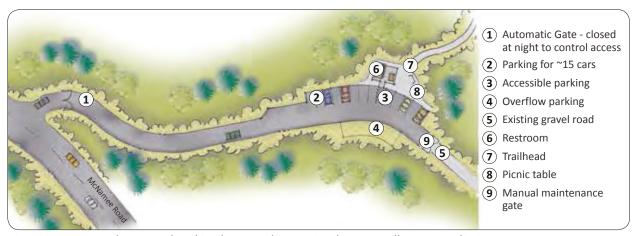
Proposed entry and parking lot at Burlington Creek Forest will accommodate ~15 cars.
